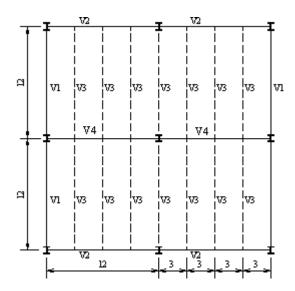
Schematic view of floor structural arrangement - configuration 04 (measures in m).
